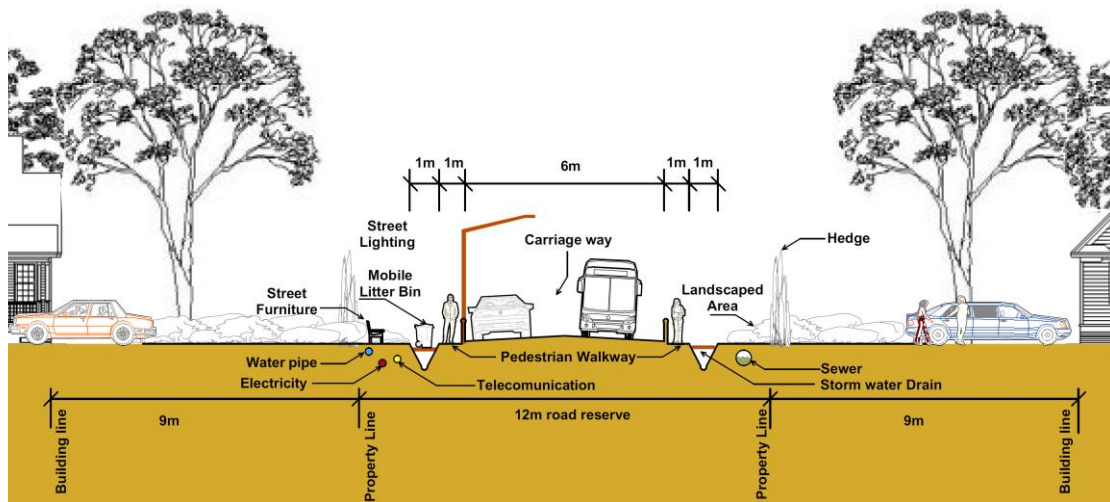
Cross section of desired street of Muyeye(Source: Author, 2014).
